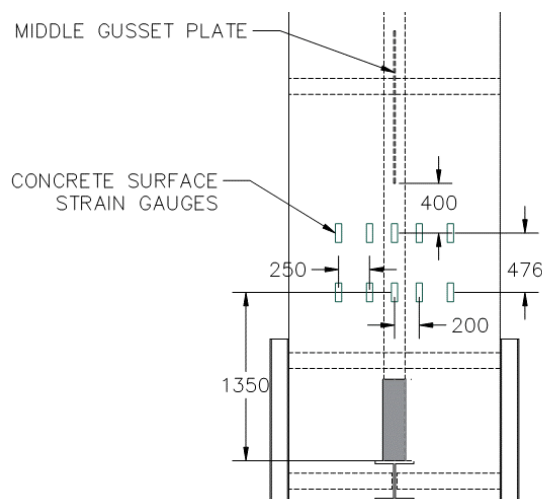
Typical concrete strain gauge layout plan on south side of the frame
